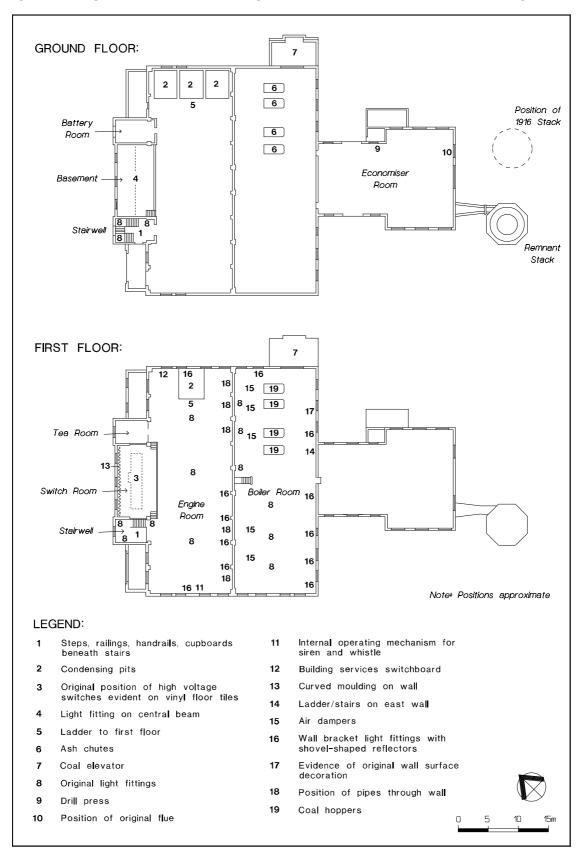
Kingston Powerhouse Precinct: Significant Internal Fabric of Power House Building
